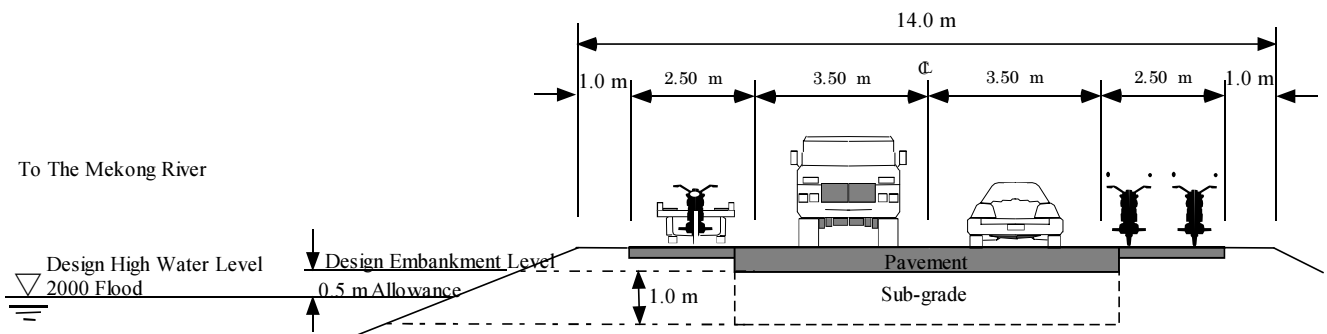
Relationship between HWL and Elevation of Road Surface
